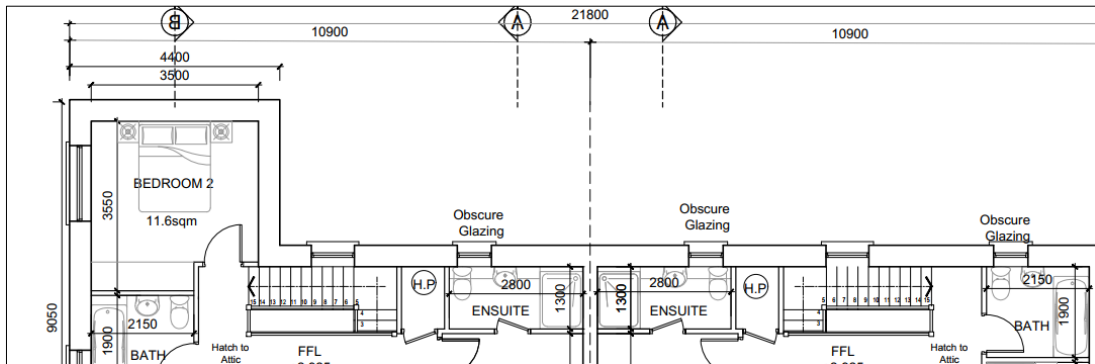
Extract from Dwg. No. PL313 Demonstrating Obscure Windows Provided
